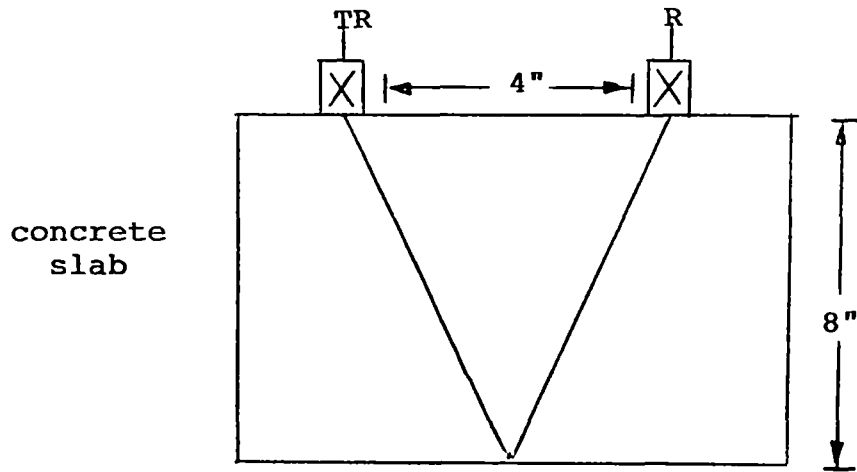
Experimental arrangement for inspection of concrete slab.
